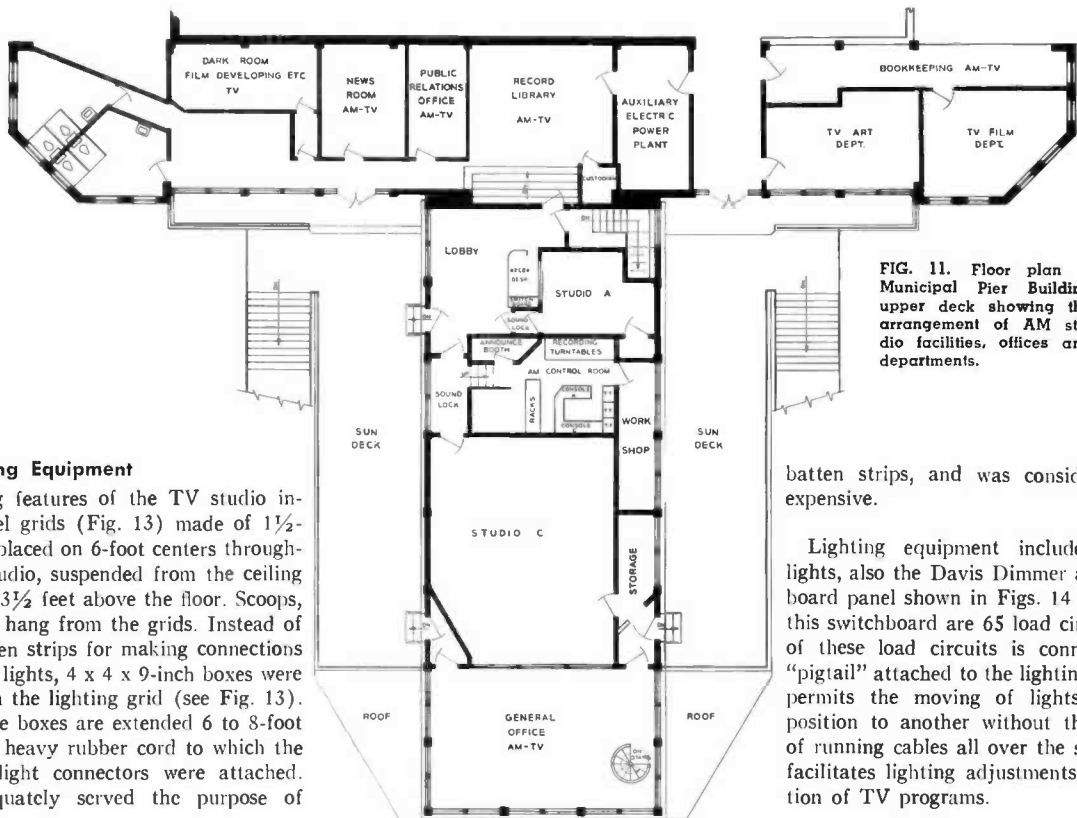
Floor plan of Municipal Pier Building upper deck showing the arrangement of AM studio facilities, offices and departments.
